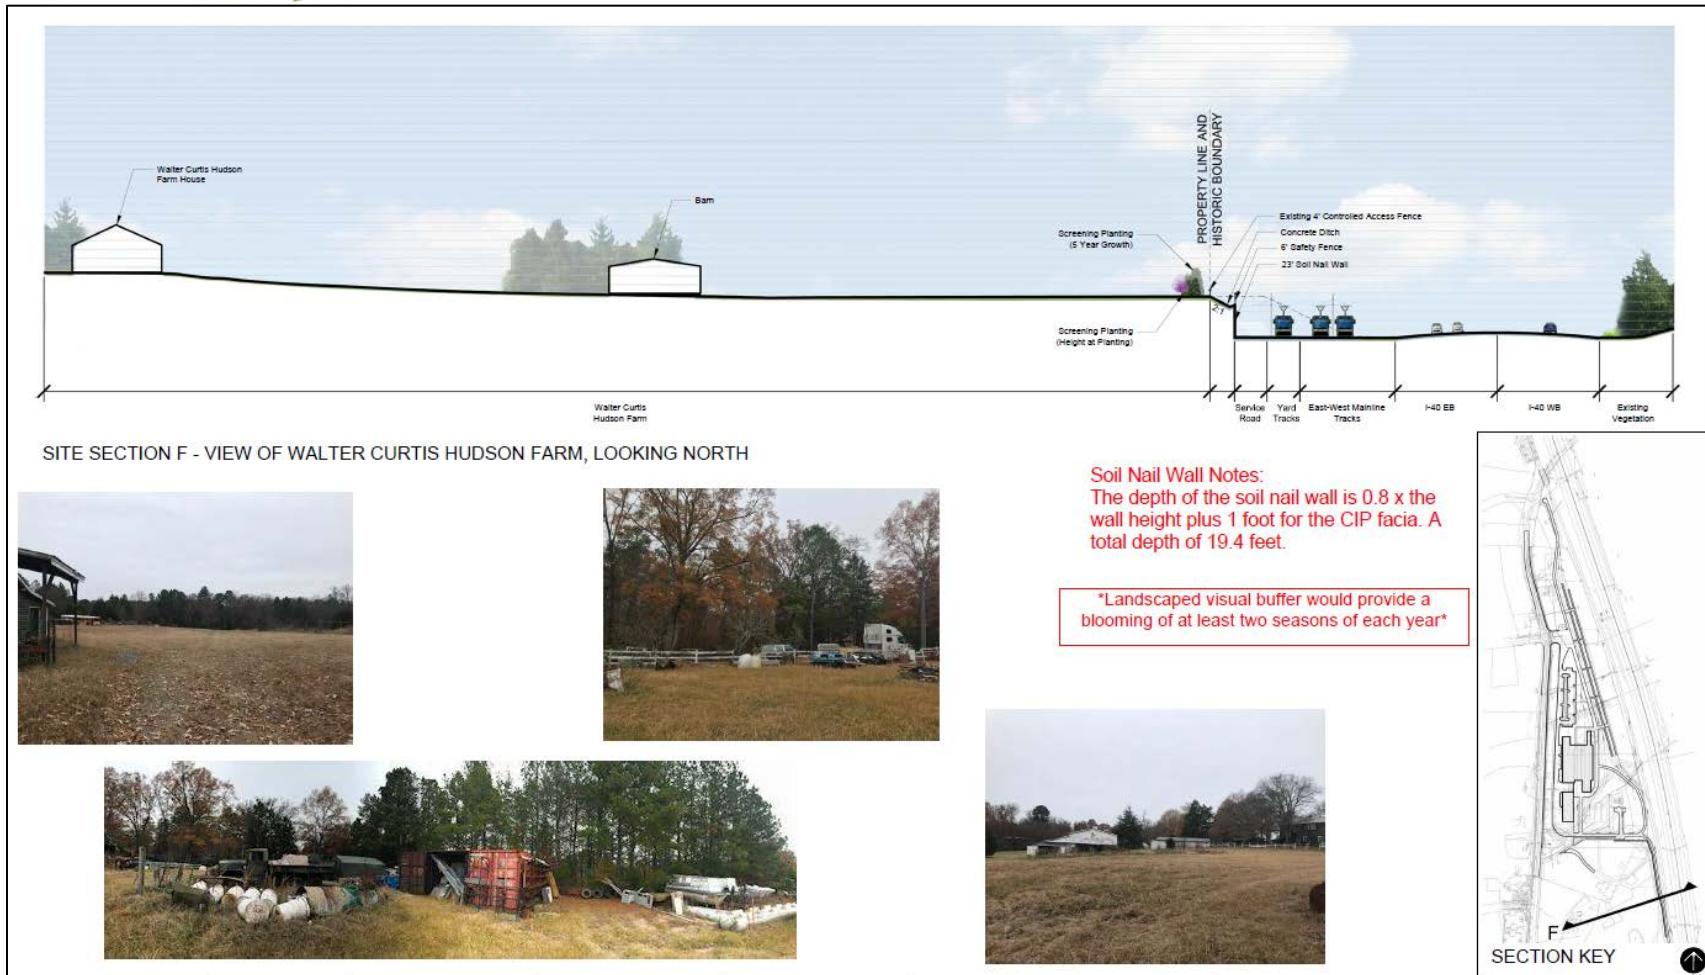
Walter Curtis Hudson Farm and Store, proposed project plans
